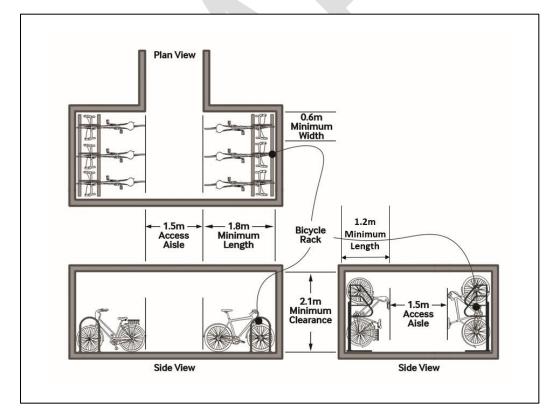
Bicycle Parking Stalls and Access Aisle Dimensions
